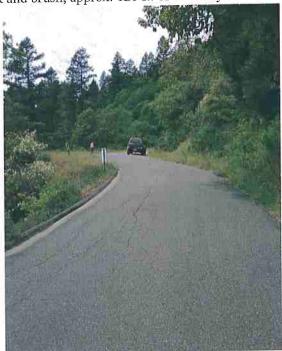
BMR PM 1.55, 14.5-wide cracking asphalt surface, longitudinal slope of 8%, narrowing to. at a fill failure and steep drop off. A culvert was observed near the fill failure. The road continues as 24-ft. wide after the pinch point, including a 15-ft. wide by 83-ft. long pullout to the west.
